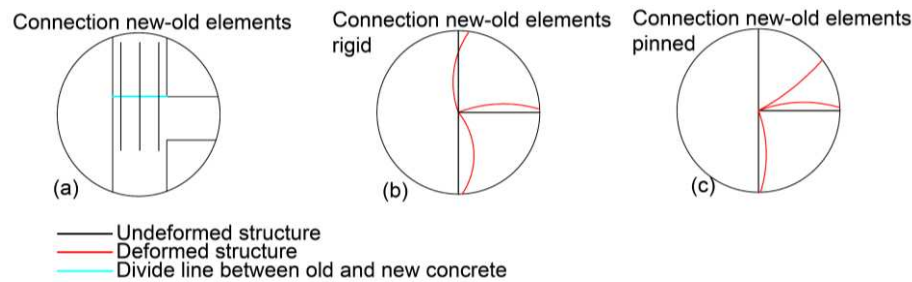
Connection at joint 6 and its deformation on rigid and hinged connections.
